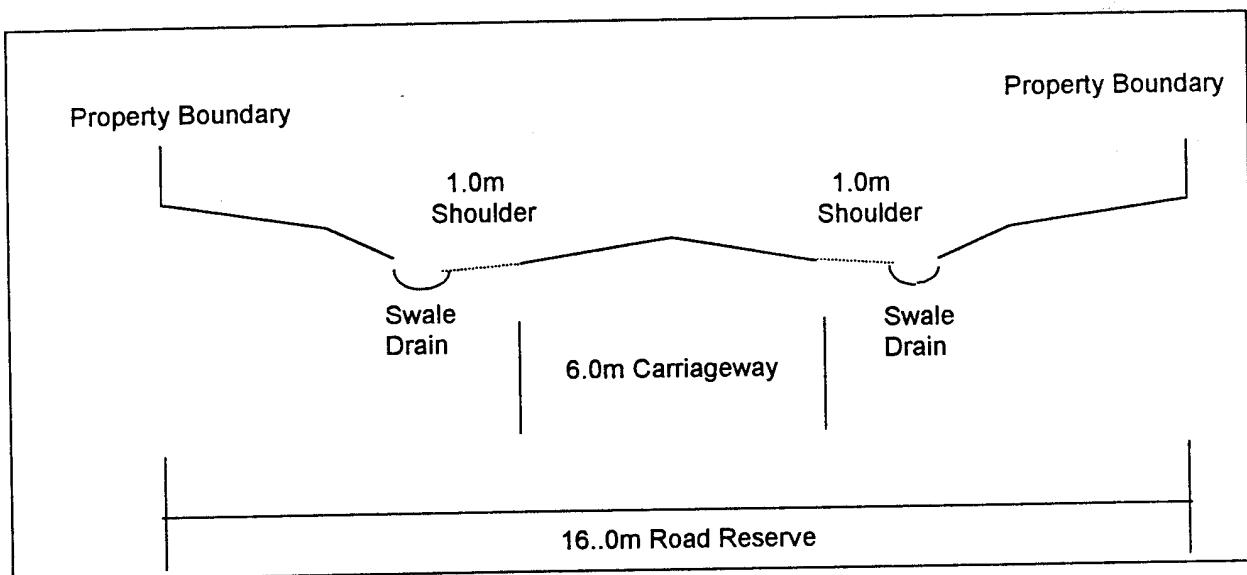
Typical Road Reserve (Potential) - Not To Scale
